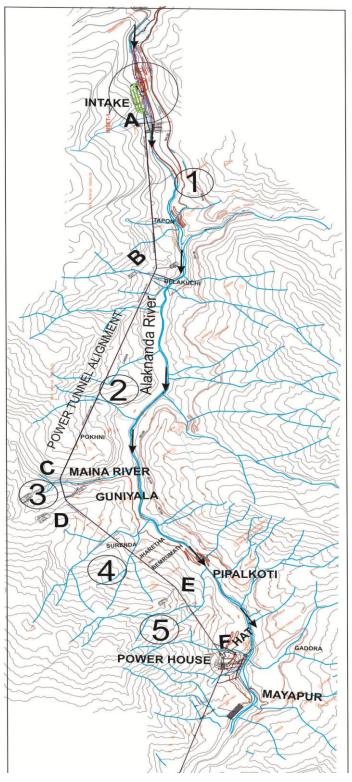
Layout map of the Vishnugad–Pipalkoti HEP showing the power tunnel alignment along the right bank of Alaknanda river
